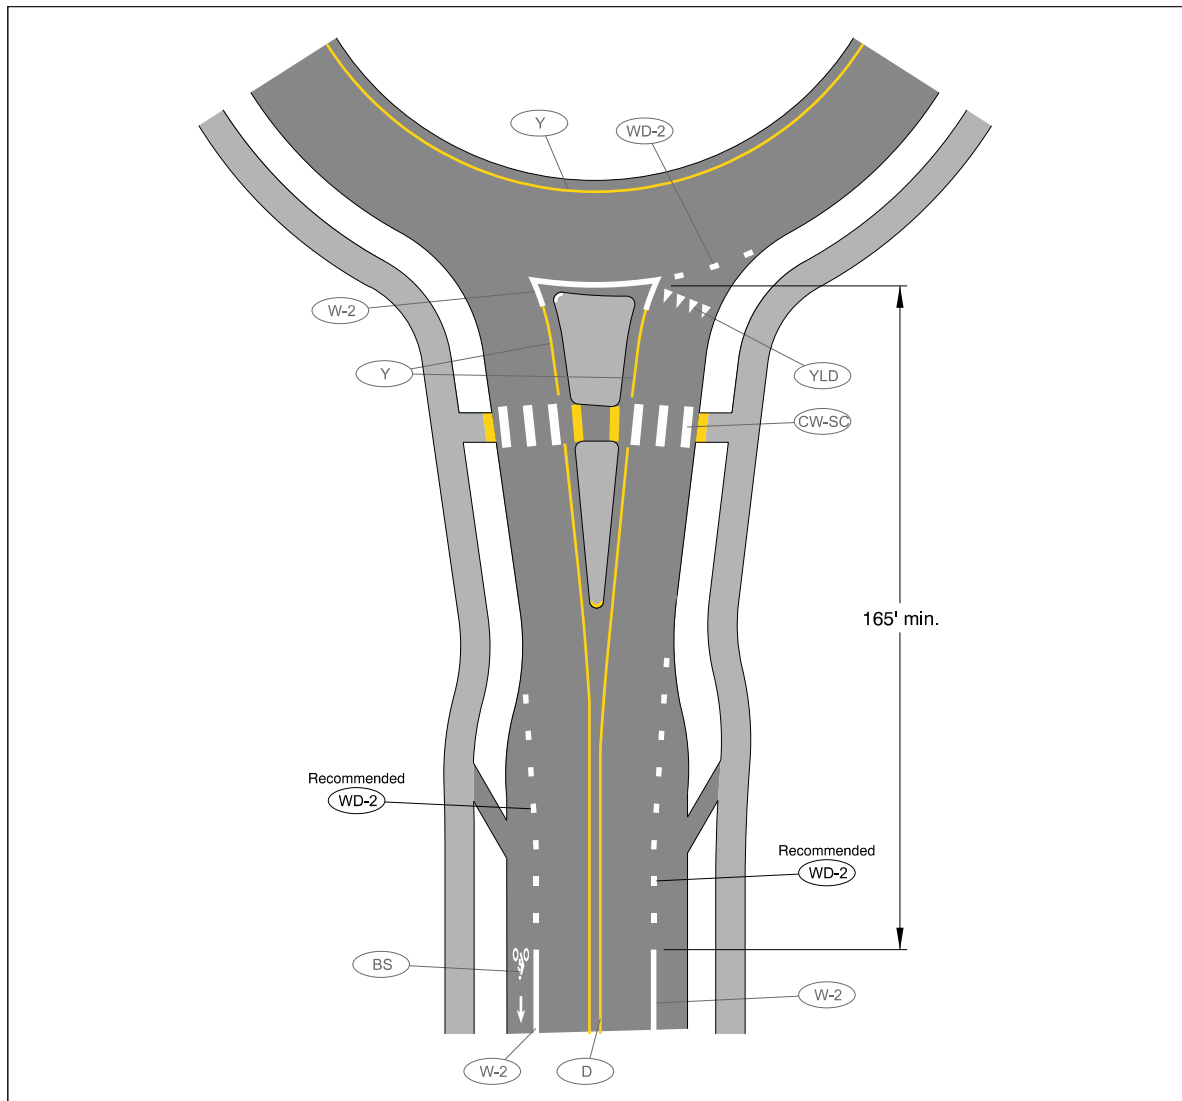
A: Typical Pavement Markings at a Single-Lane Roundabout
